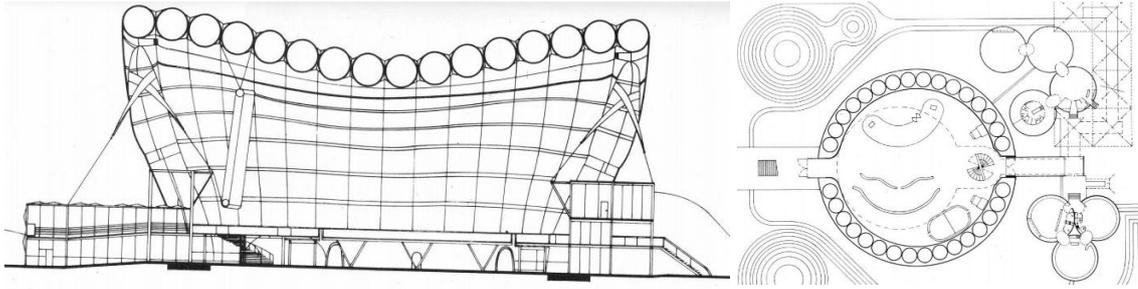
Fuji pavilion, section and floor plan [7]
